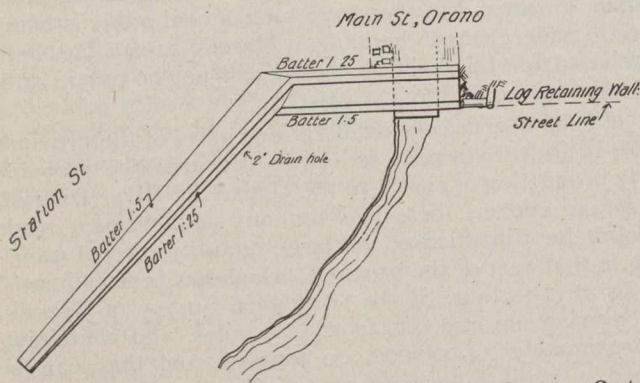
Location of Retaining Wall at Orono, Ont.
